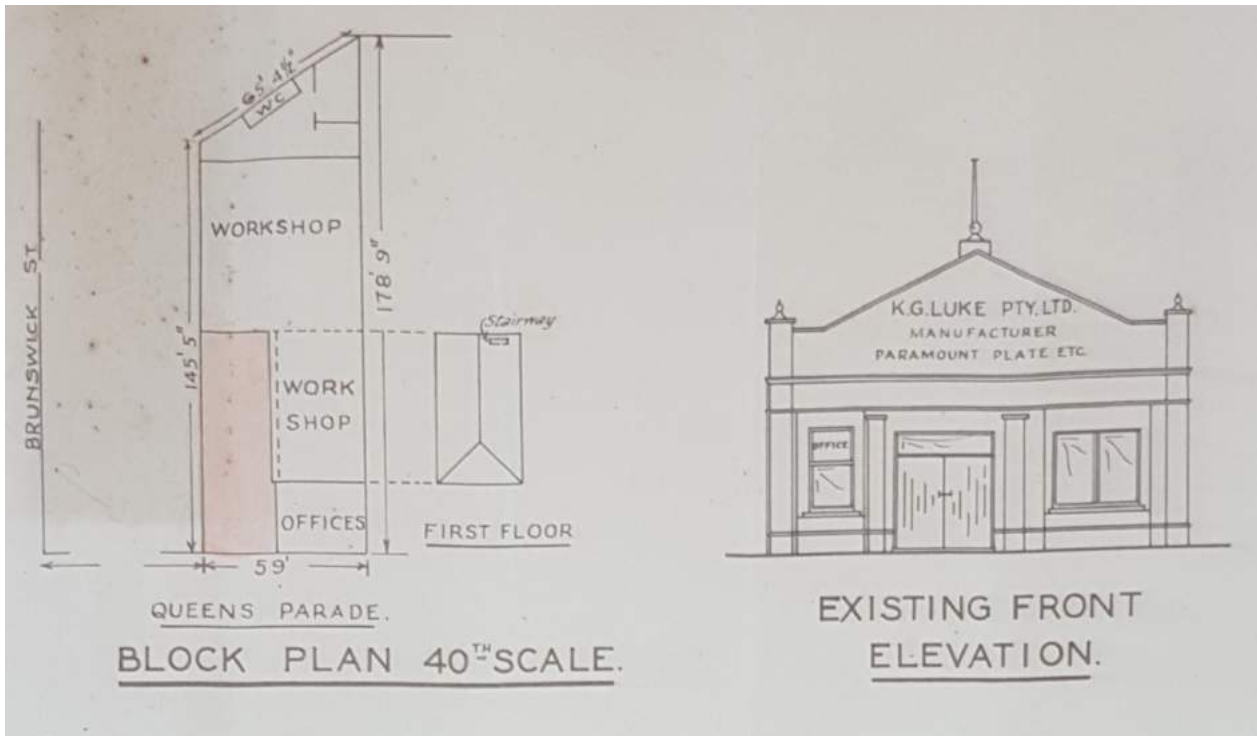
1933 drawings – The 1933 footprint and facade of the factory; altered to form the section that now has a double-gabled roof (PROV, 1933).
